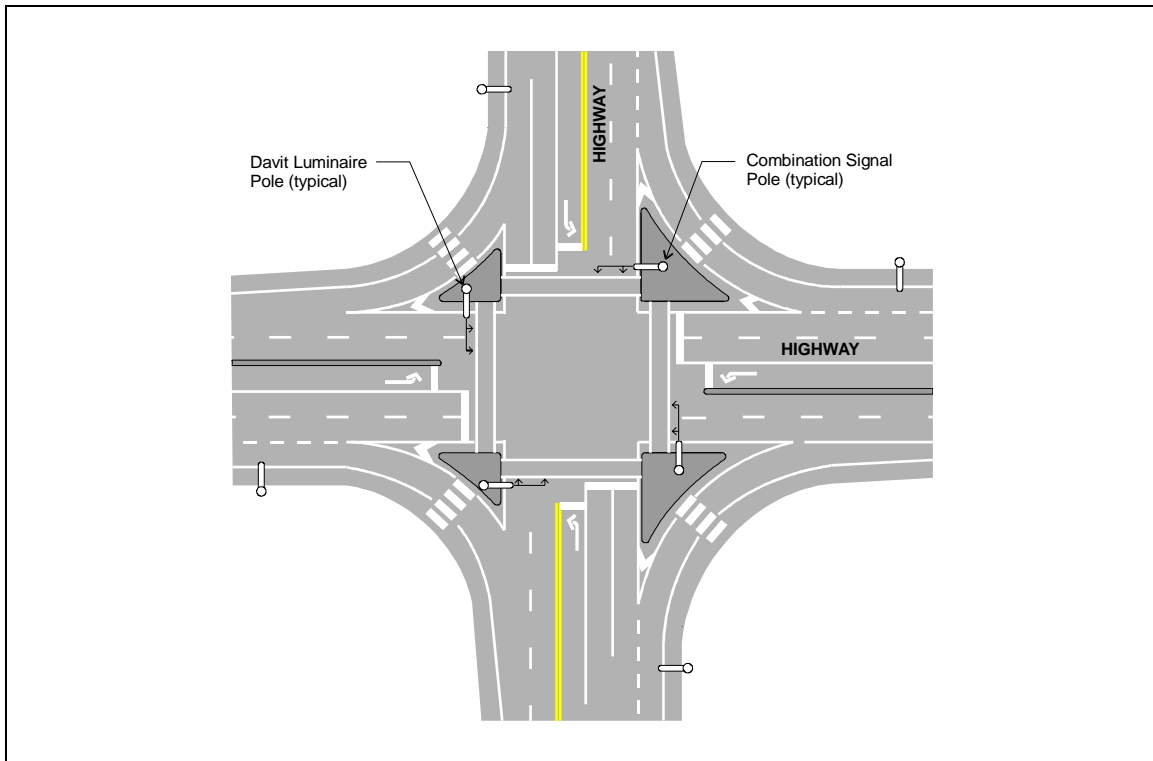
Typical Major Intersection of Two Highways – Full Lighting
